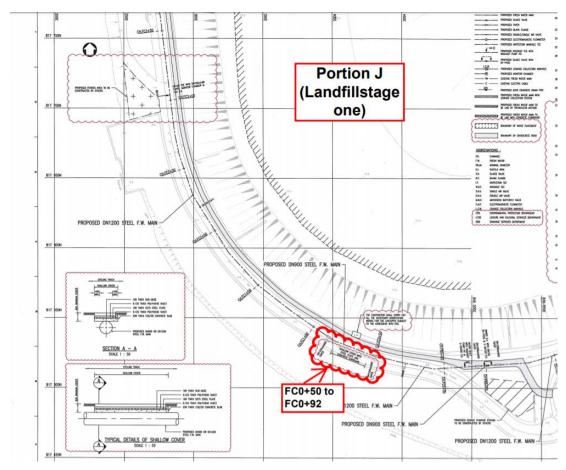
Location Plan – Landfill Stage 1 (Area FC0+50 -FC0+92)
